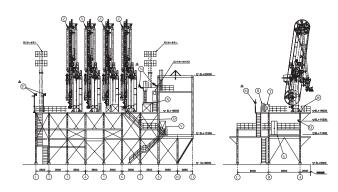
Existing unloading arms for liquefied natural gas (LNG)
